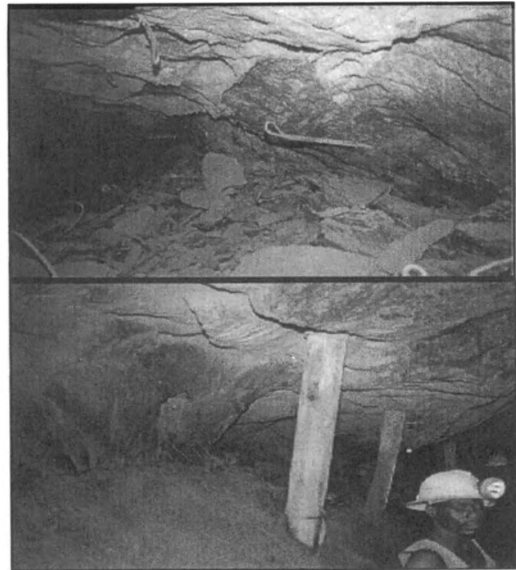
Example of a scaling pillar and a gully siding supported with timber props
